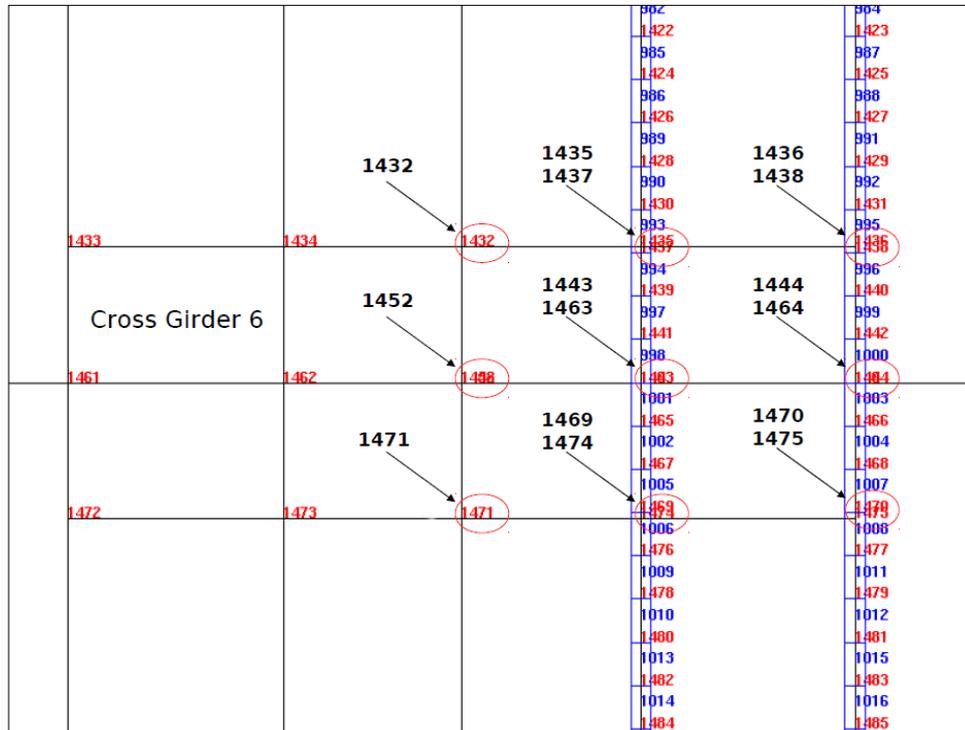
Top view of the railway girder across cross girder 6 and nodal discretization.
